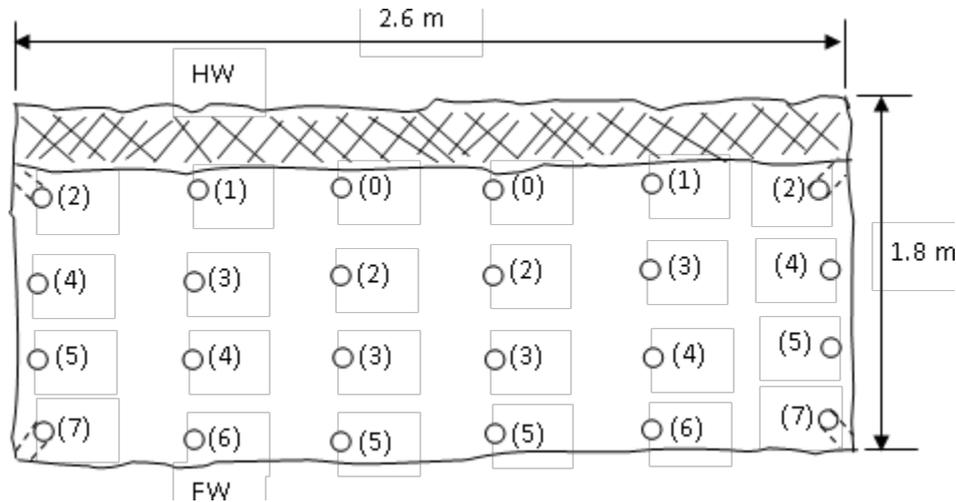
(a): Drift-Drill and Blast pattern
